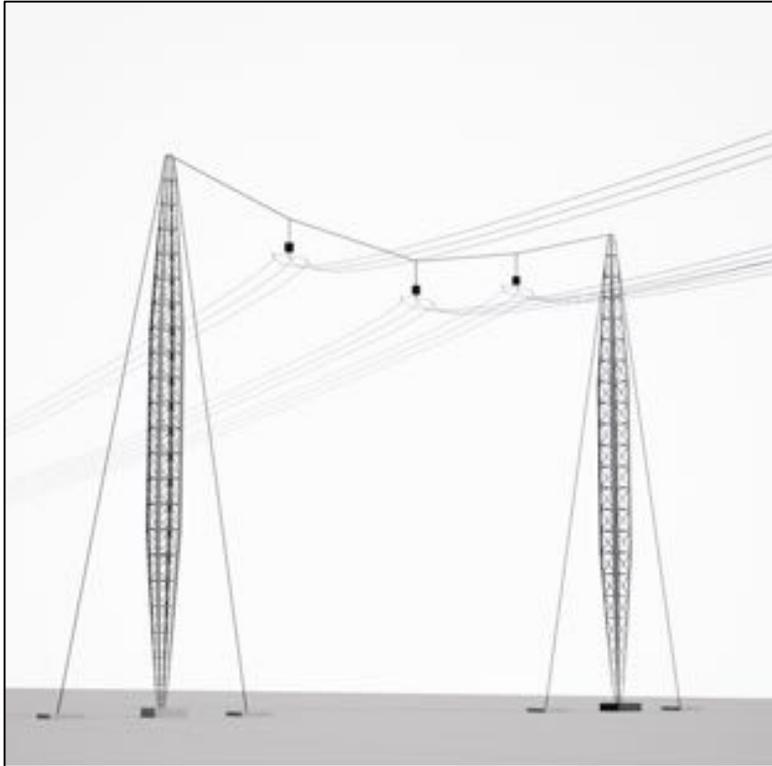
Crossrope Tower (source: www.spacedesignstudio.co.za)
